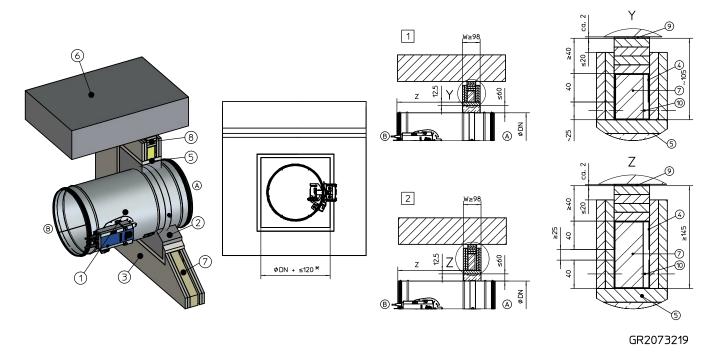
Mortar-based installation in lightweight partition wall with flexible ceiling joint (drawing shows flexible ceiling joint acc. to DIN 4102)
